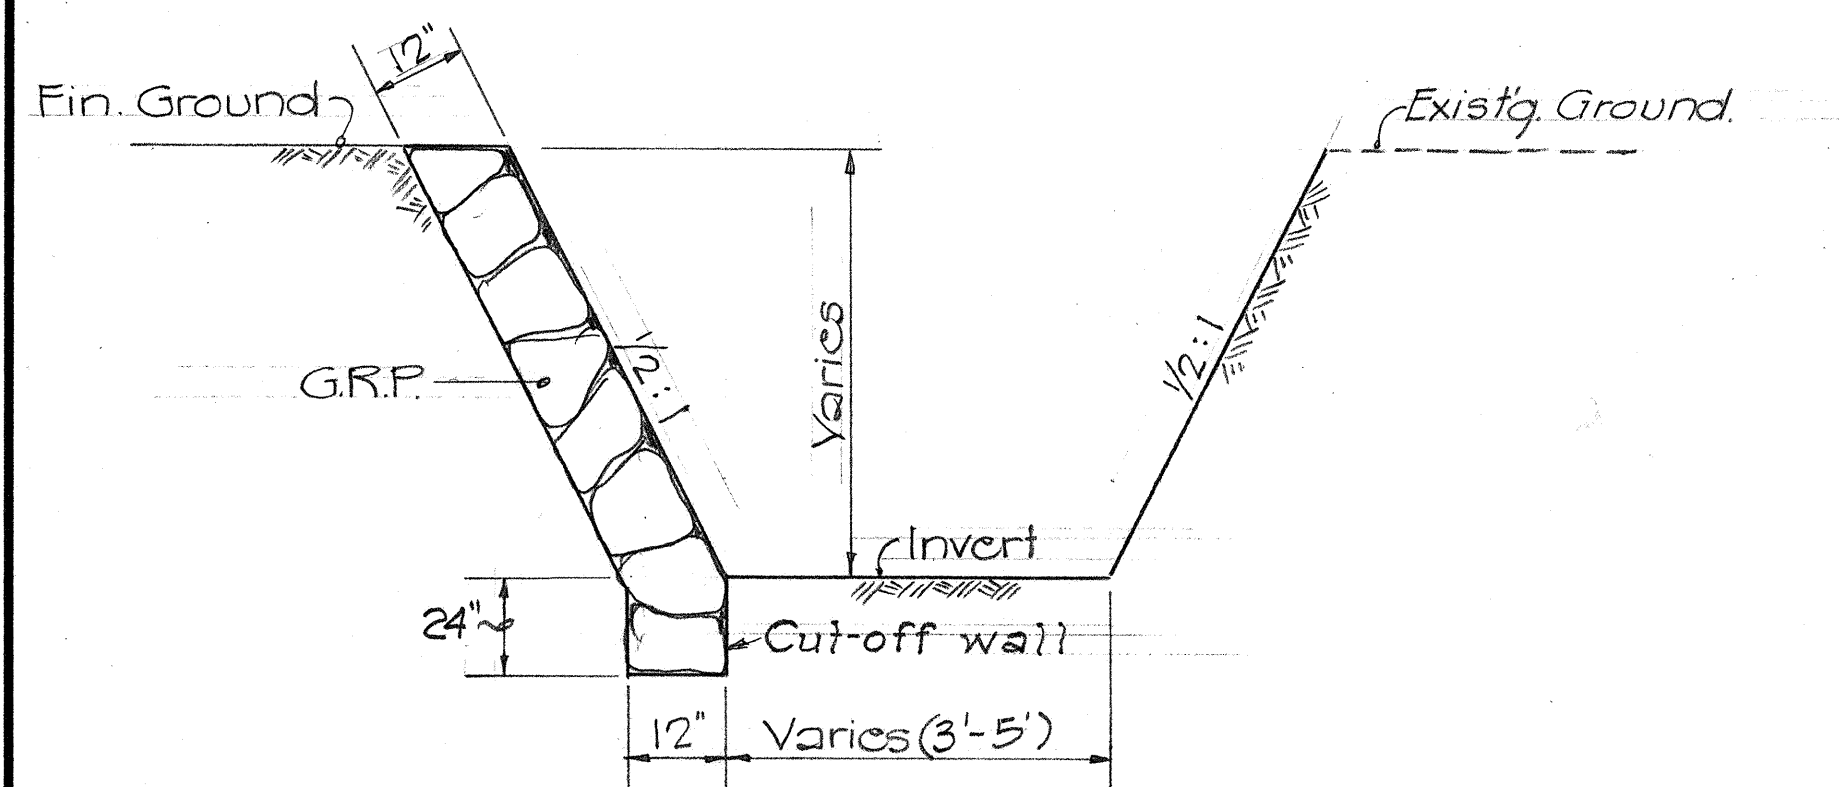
DETAILS ~ C.R.M. WALL & G.R.P. DITCH PROTECTION AT STA. 38+00 RT.
